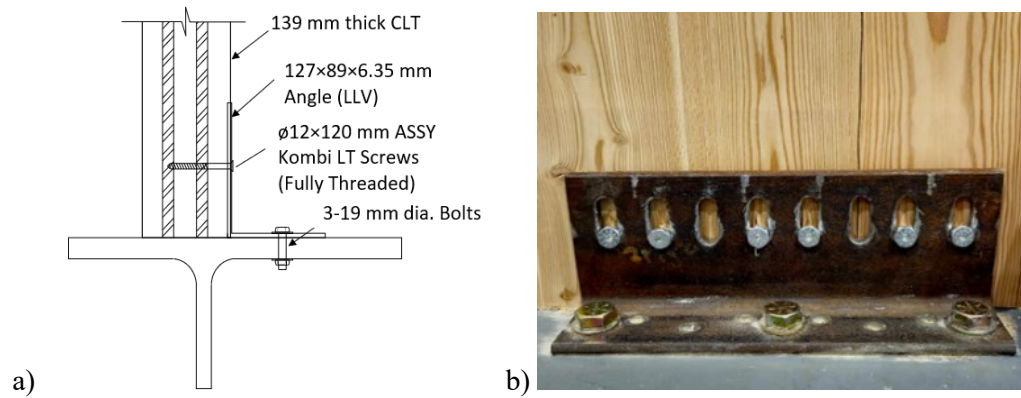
Custom shear bracket: a) schematic; b) SB attached by STS and bolts
